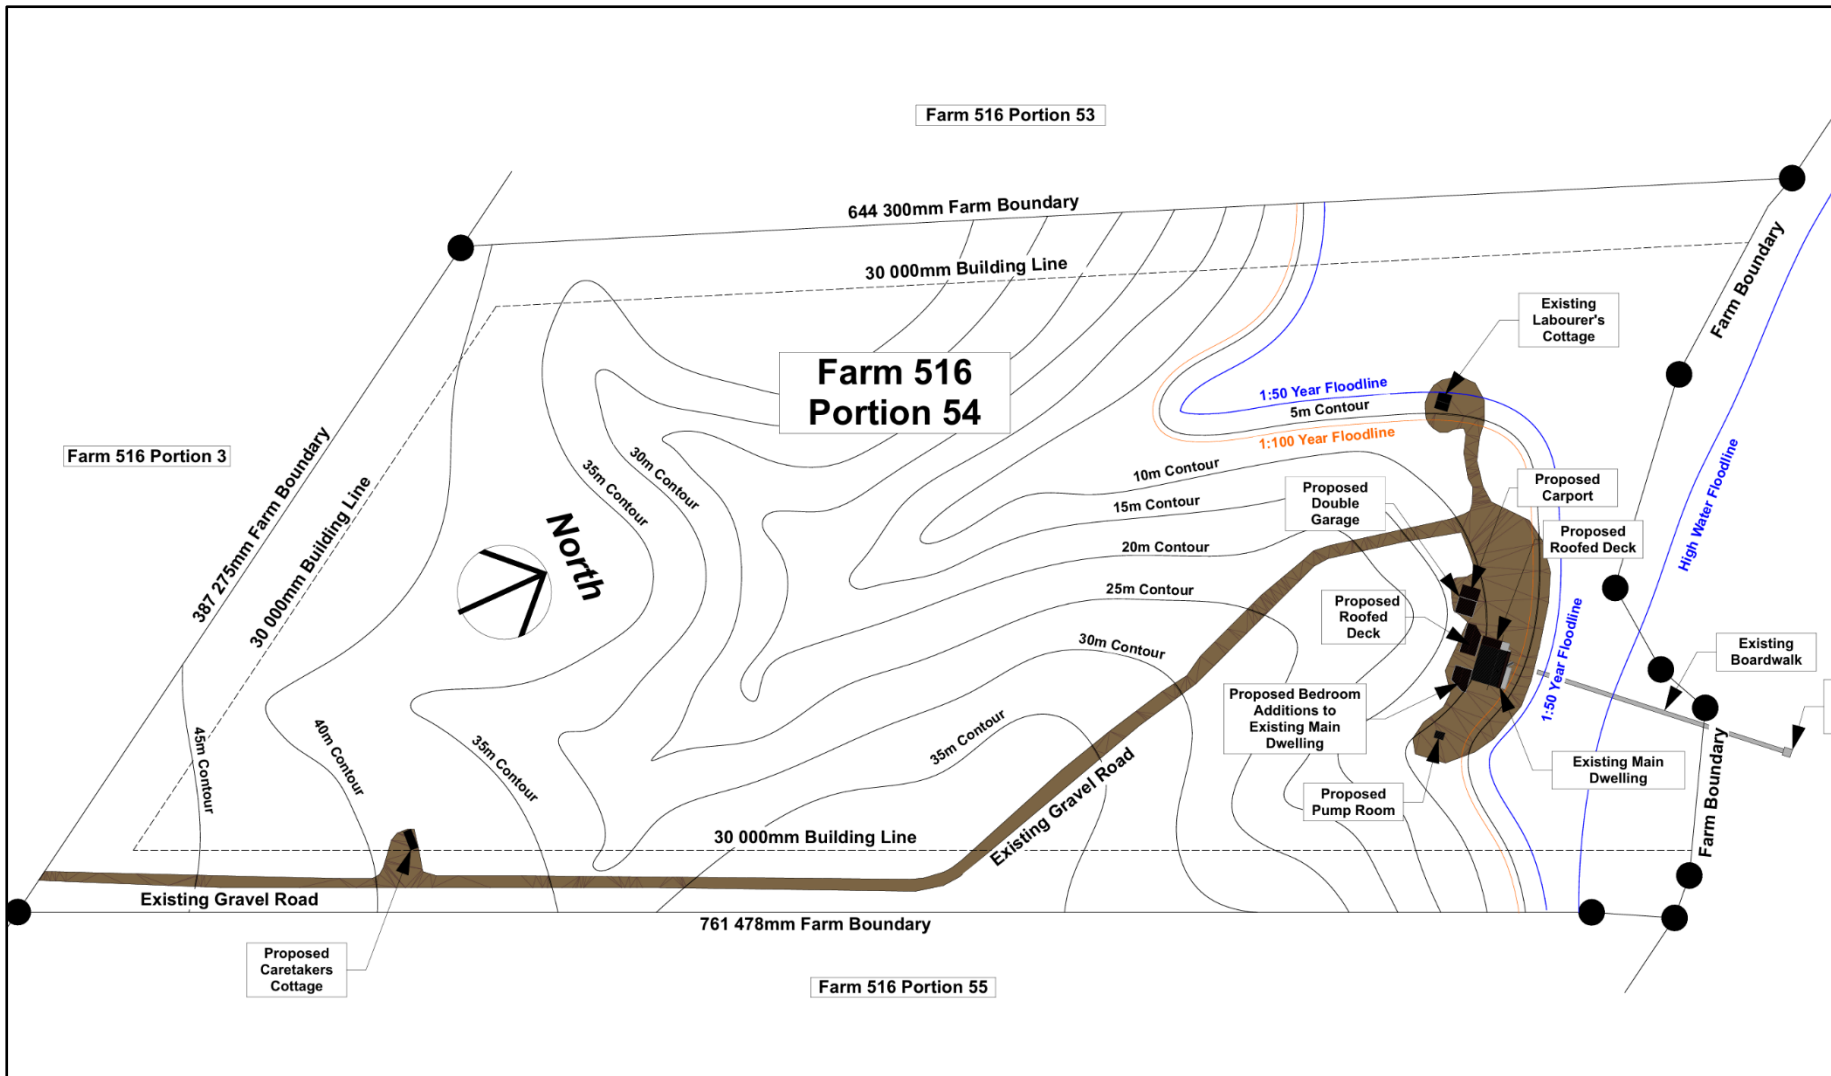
Proposed Site Development Plan for Portion 54 of Farm 516, Infanta
